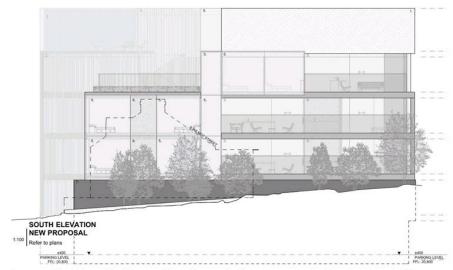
The Southern Elevation of the proposed development (Source: Room11 Architects).
